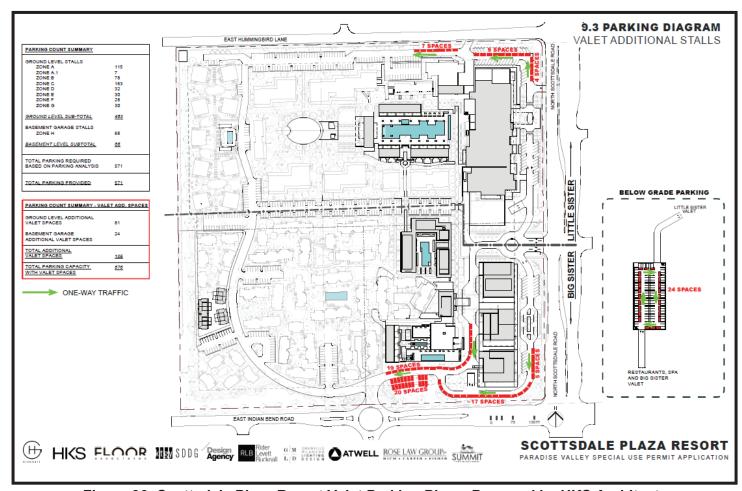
Scottsdale Plaza Resort Valet Parking Plan – Prepared by HKS Architects
